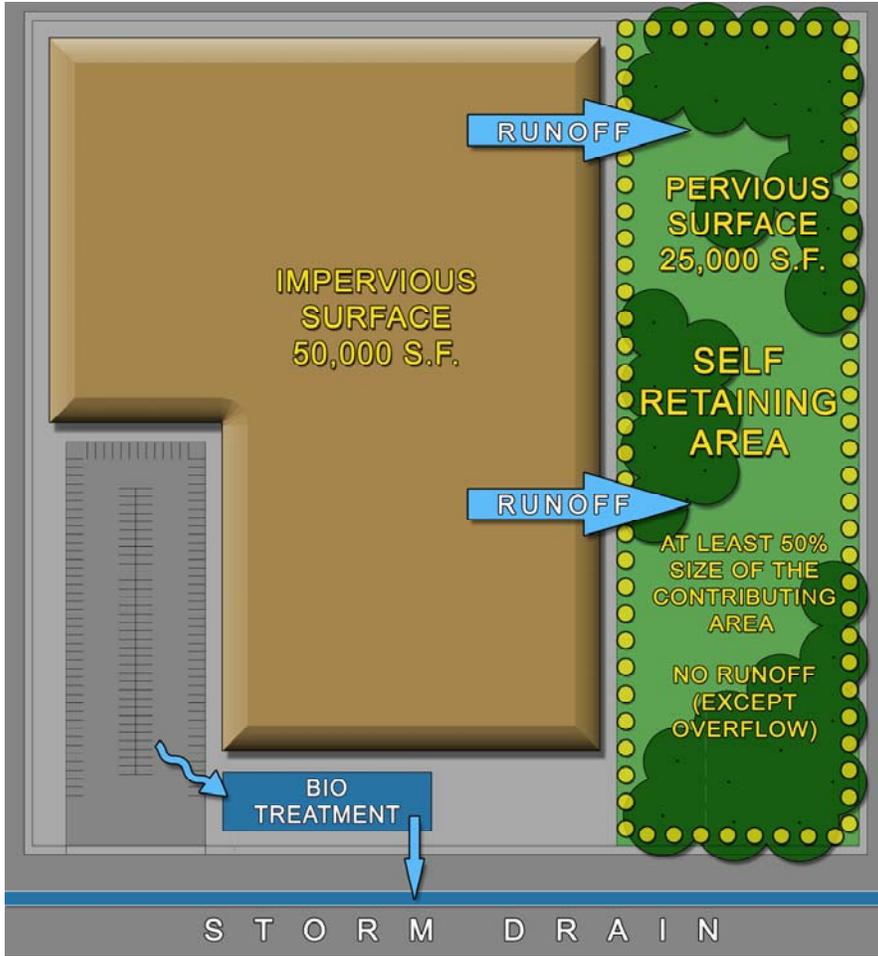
Schematic Drainage Plan for Site with a Self-Retaining Area
